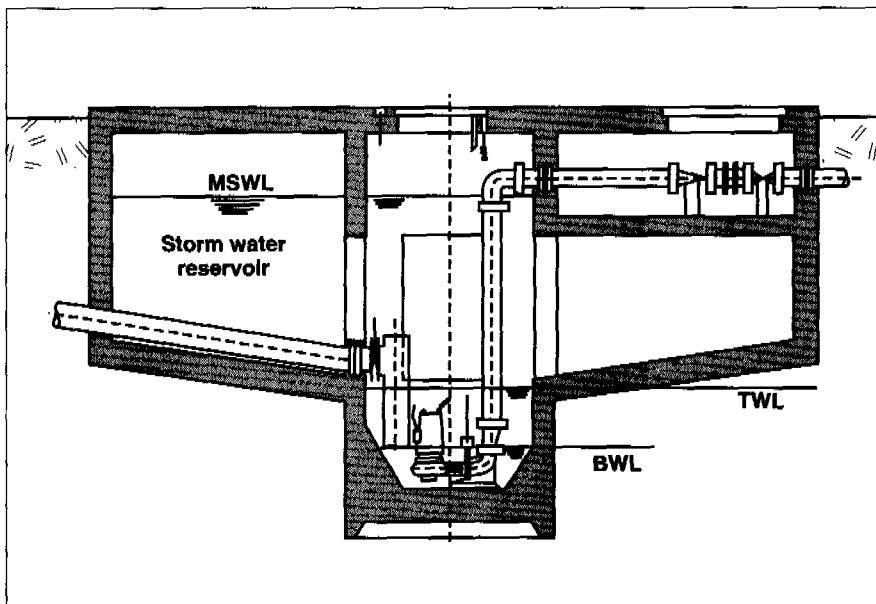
Typical arrangement of a sewage and stormwater pumping station with sewage pumping units with a submersible electric motors installation.
